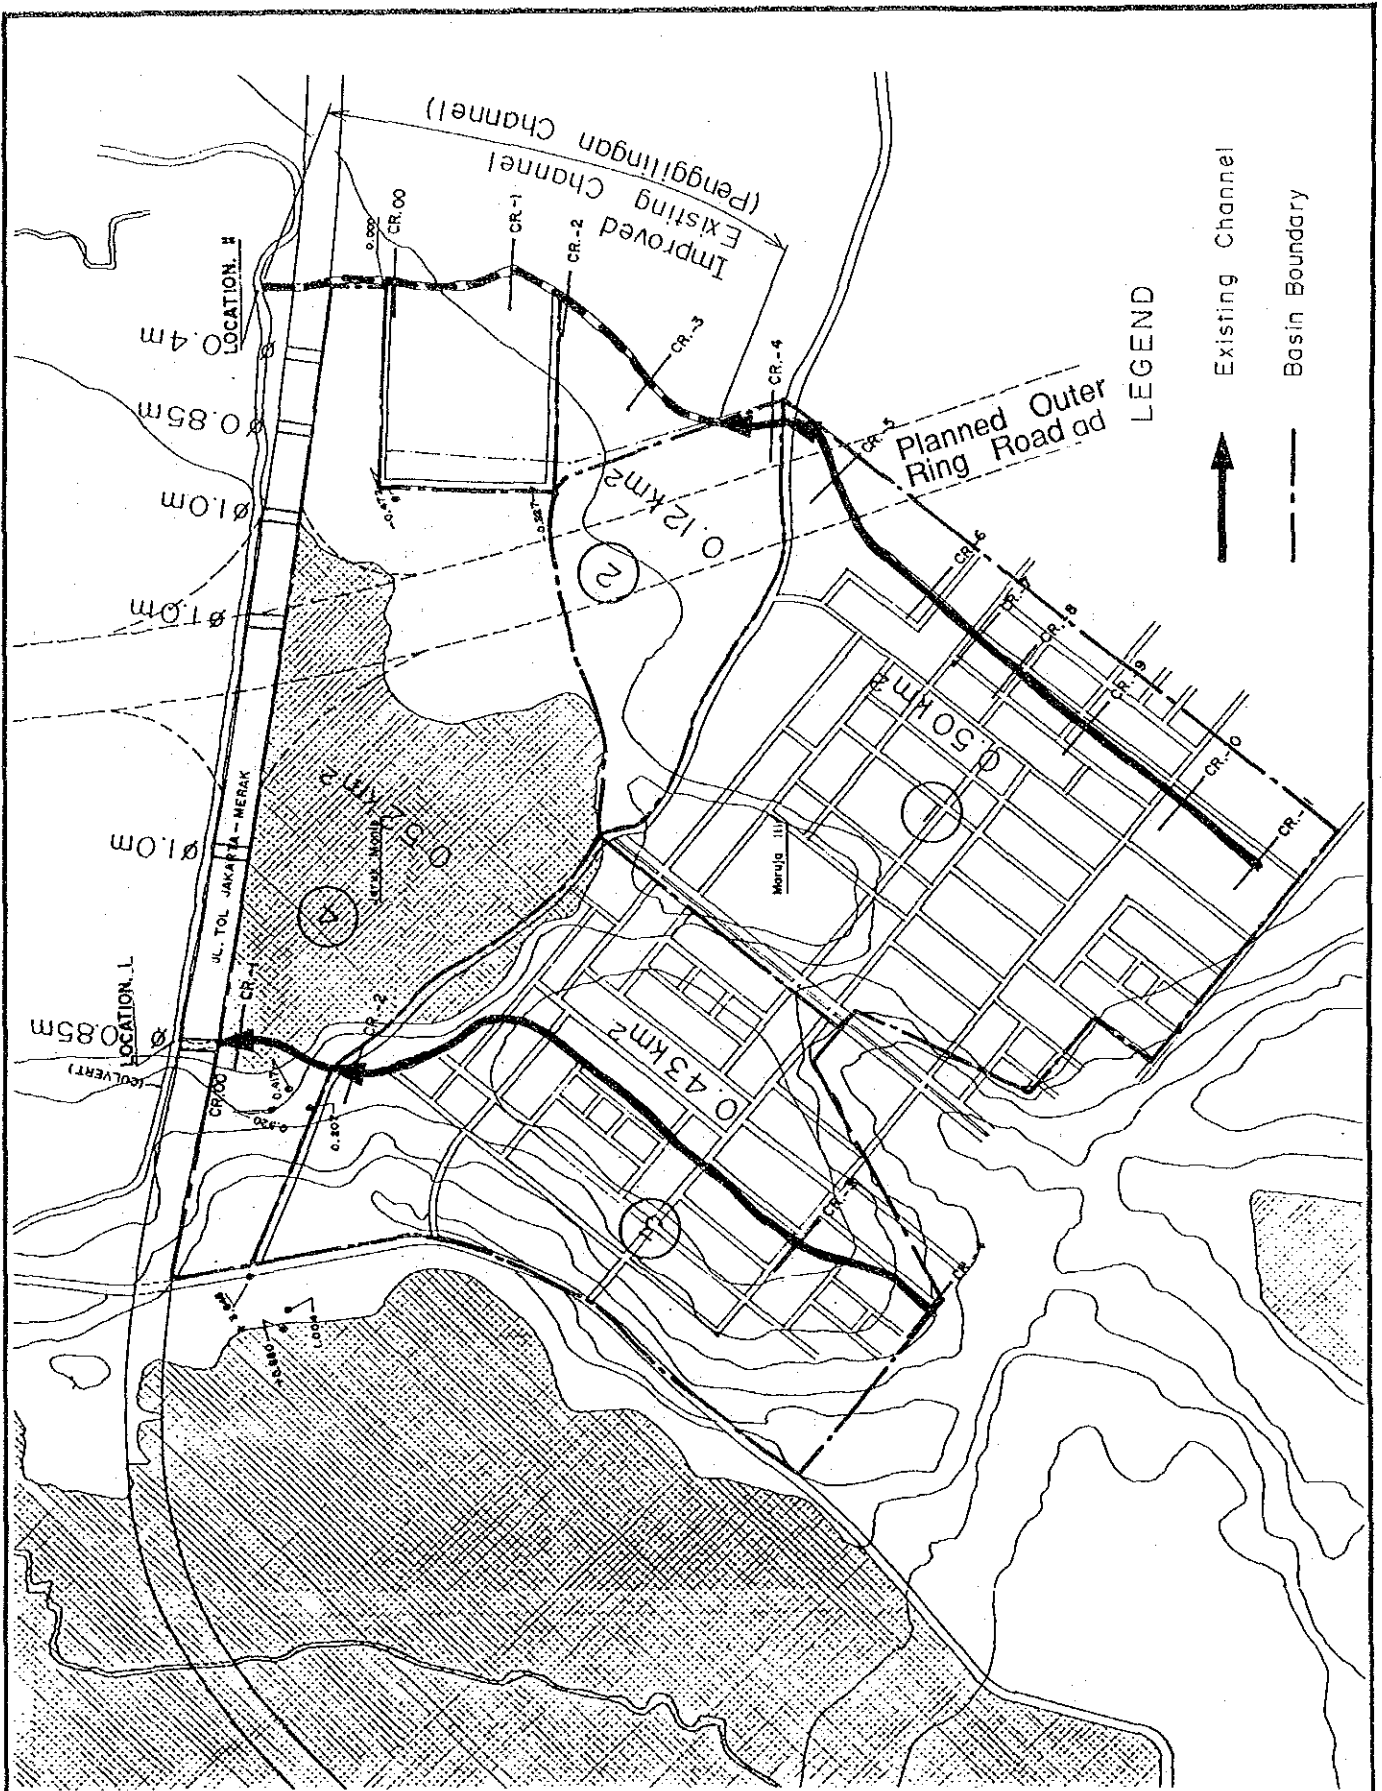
EXISTING DRAINAGE SYSTEM
